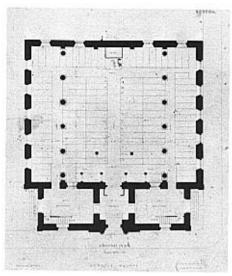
CHURCH IN BRATTLE SQUARE, BOSTON. Ground floor plan. Drawing by Gridley J.F. Bryant, 1866. (SPNEA collection.)
